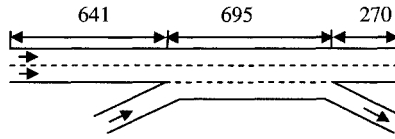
Ramp Weave Section, Baltimore –Washington Parkway
